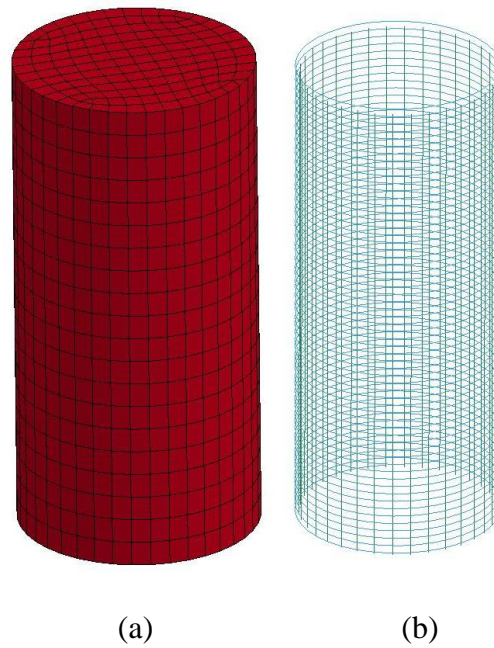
Modeling of RC column (a) concrete modeled as solid elements, (b) reinforcements modeled as beam elements.
